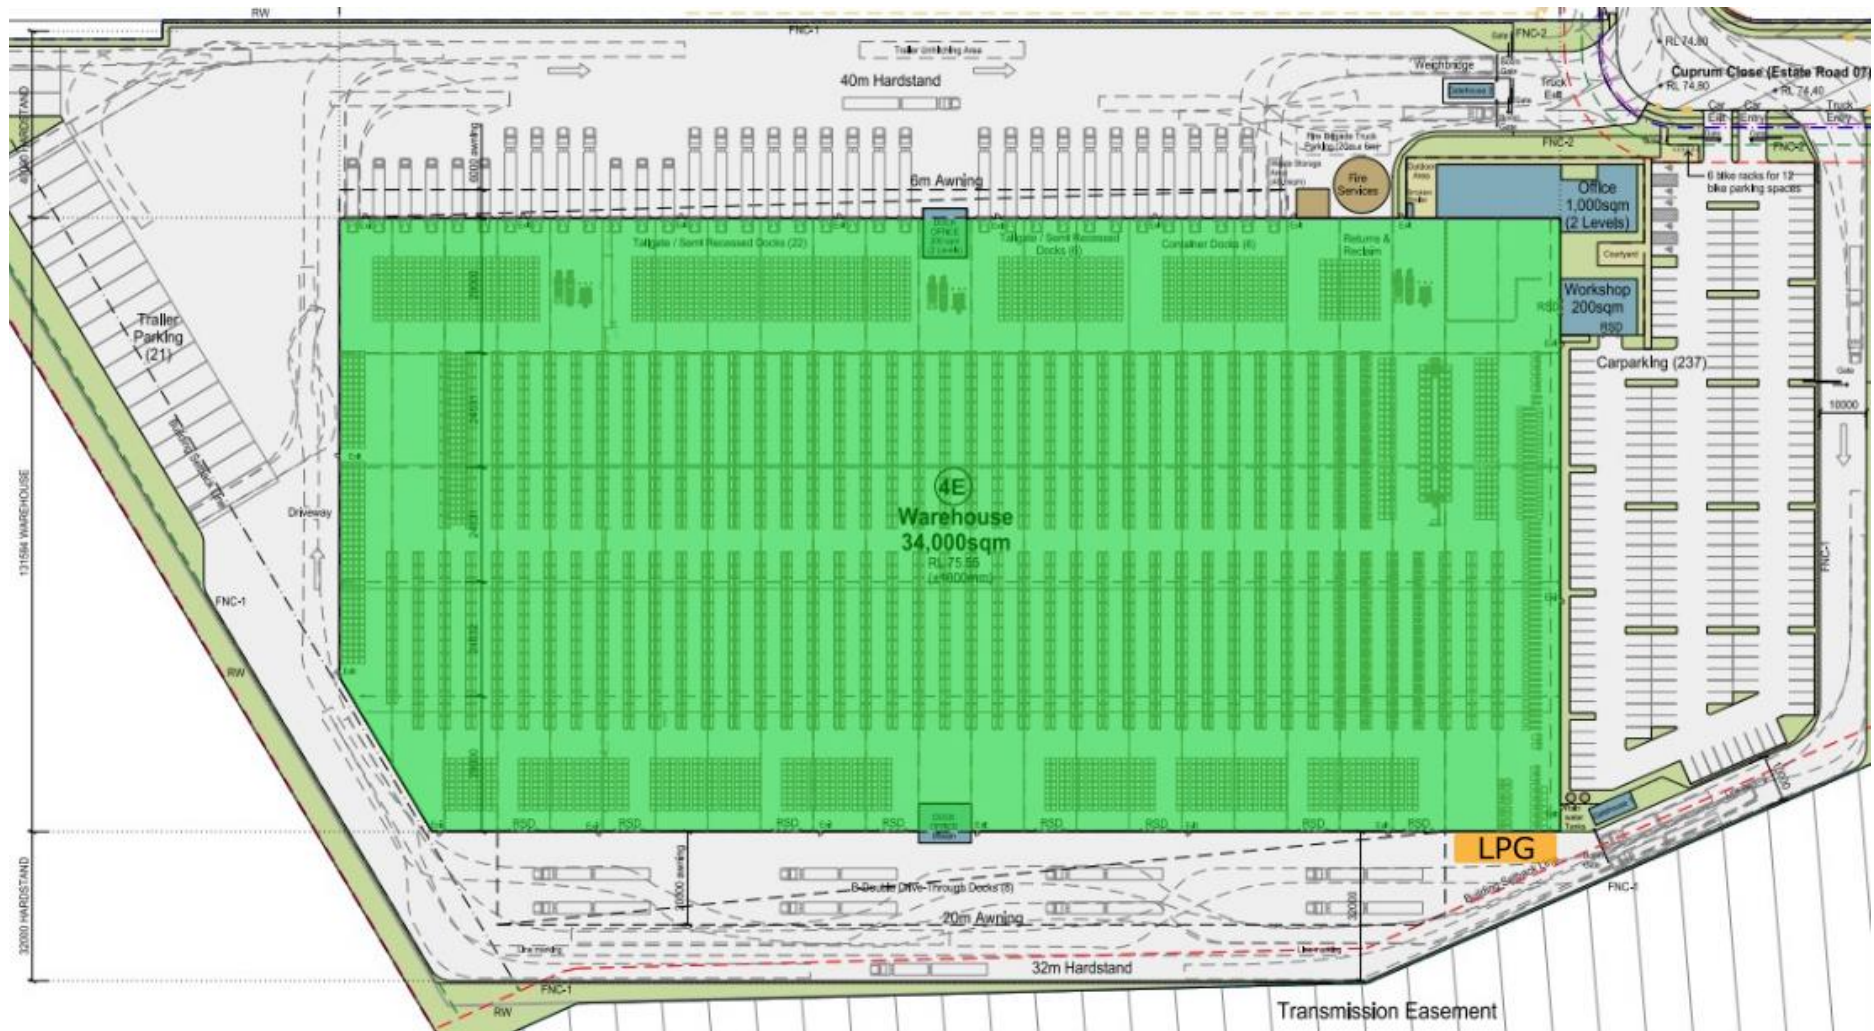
Allowable flammable liquid storage area (green) and LPG storage location
